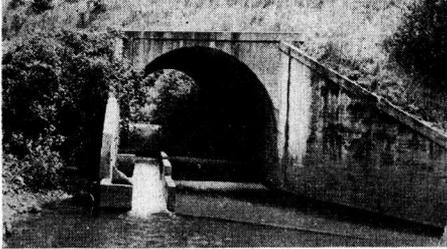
Rattlesnake Creek—Energy-dissipator with Drop Inside the Arch Culvert. Note fish ladder at left.
